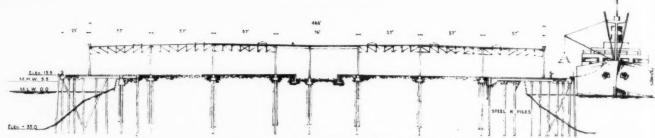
Typical cross-section of Mystic Pier No. 1.
